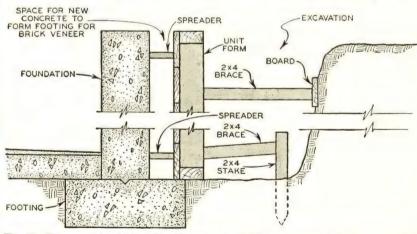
Formwork for Adding New Concrete to Old Foundation to Make Provision for Addition of Brick Veneer
